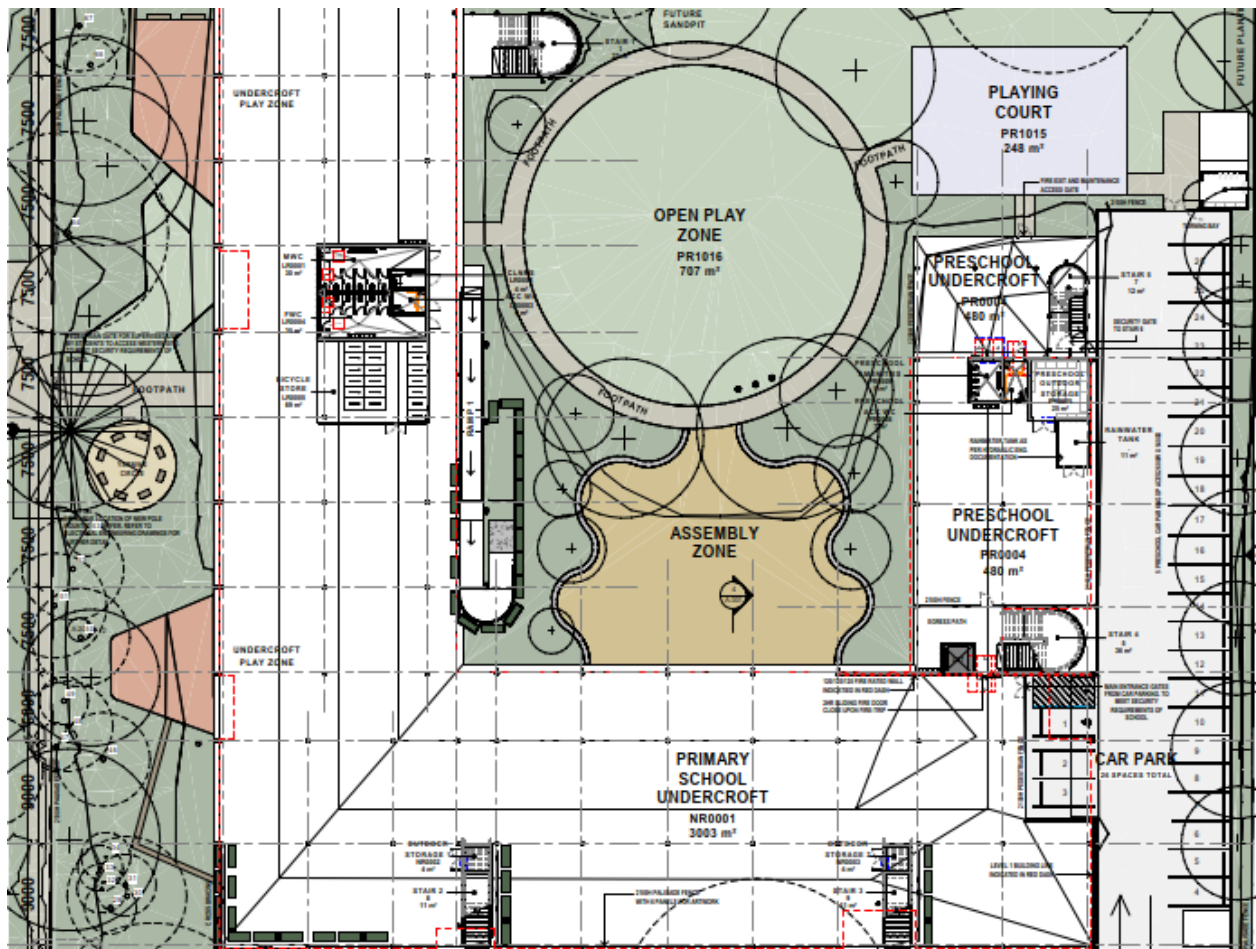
Proposed site plan (Source: EJE, 2025)
